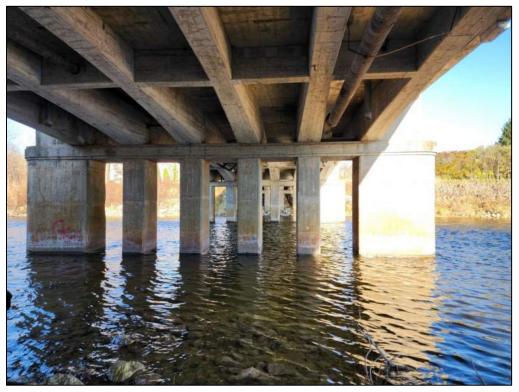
Pier 2 – West Face (crack and light scaling)
